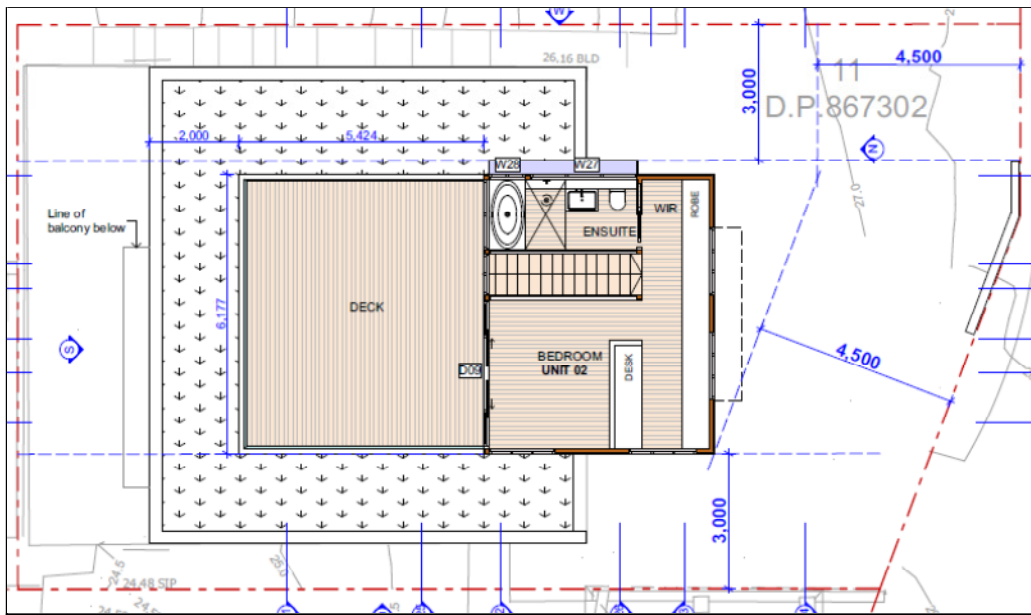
Second Floor Plan - DA17 Issue L (Source: mm+j architects)
